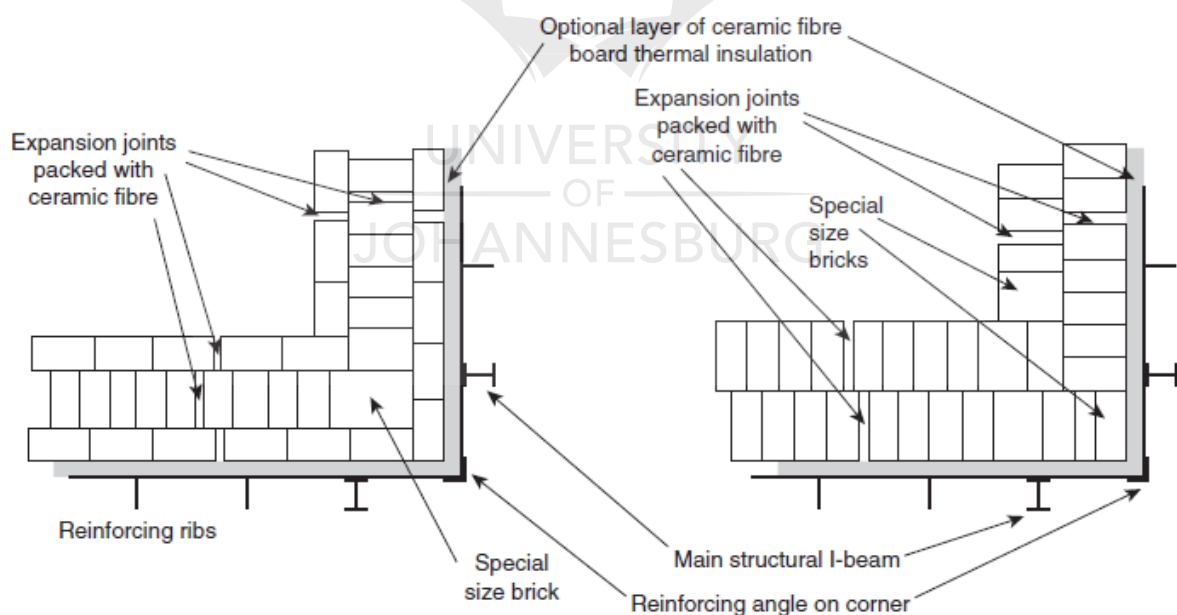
Characteristic brick lining construction showing expansion joints with steel reinforcing (Jenkins and Mullinger, 2011)
